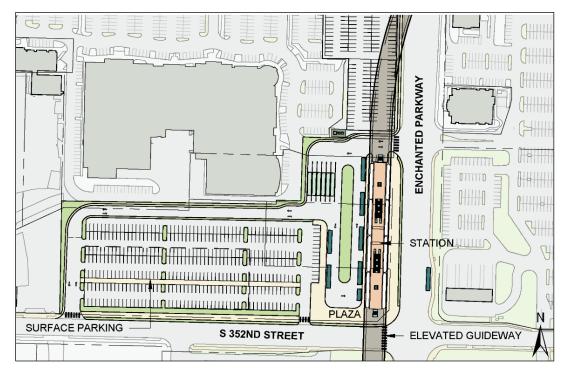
SF Enchanted Parkway Station with Surface Parking
